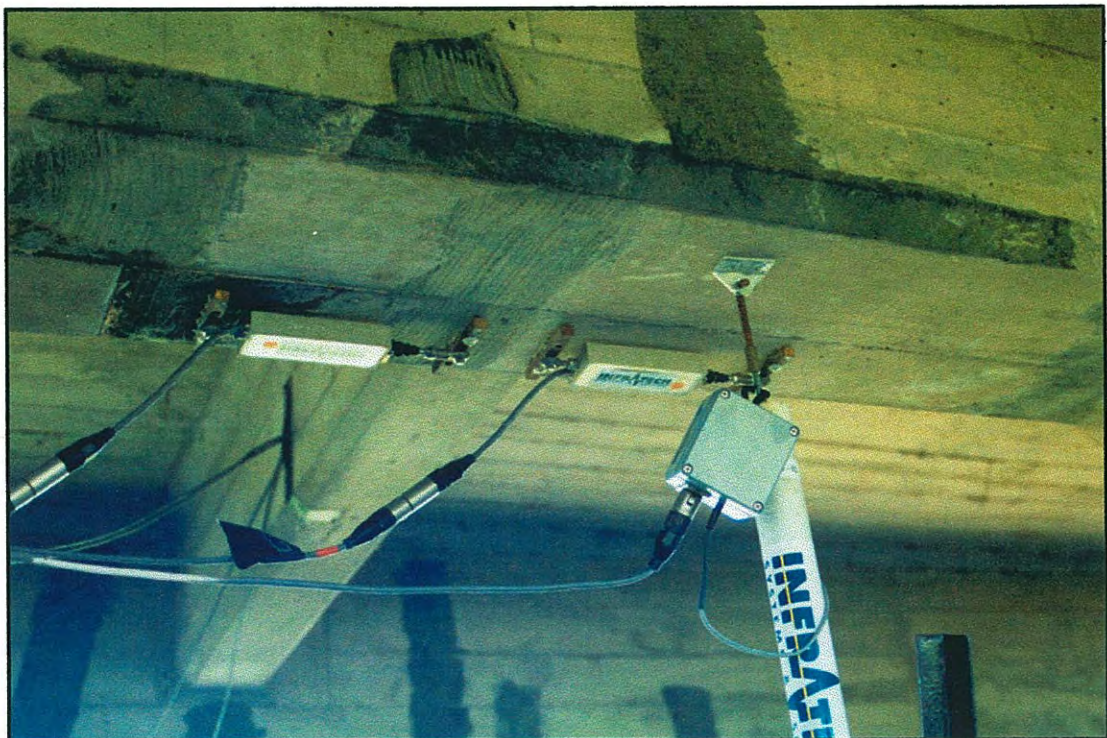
Instrumentation on Girder 2 of the bridge.
